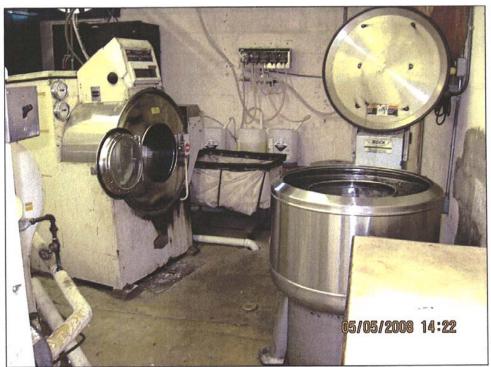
Typical view of the equipment located in the northwest corner of the facility.
